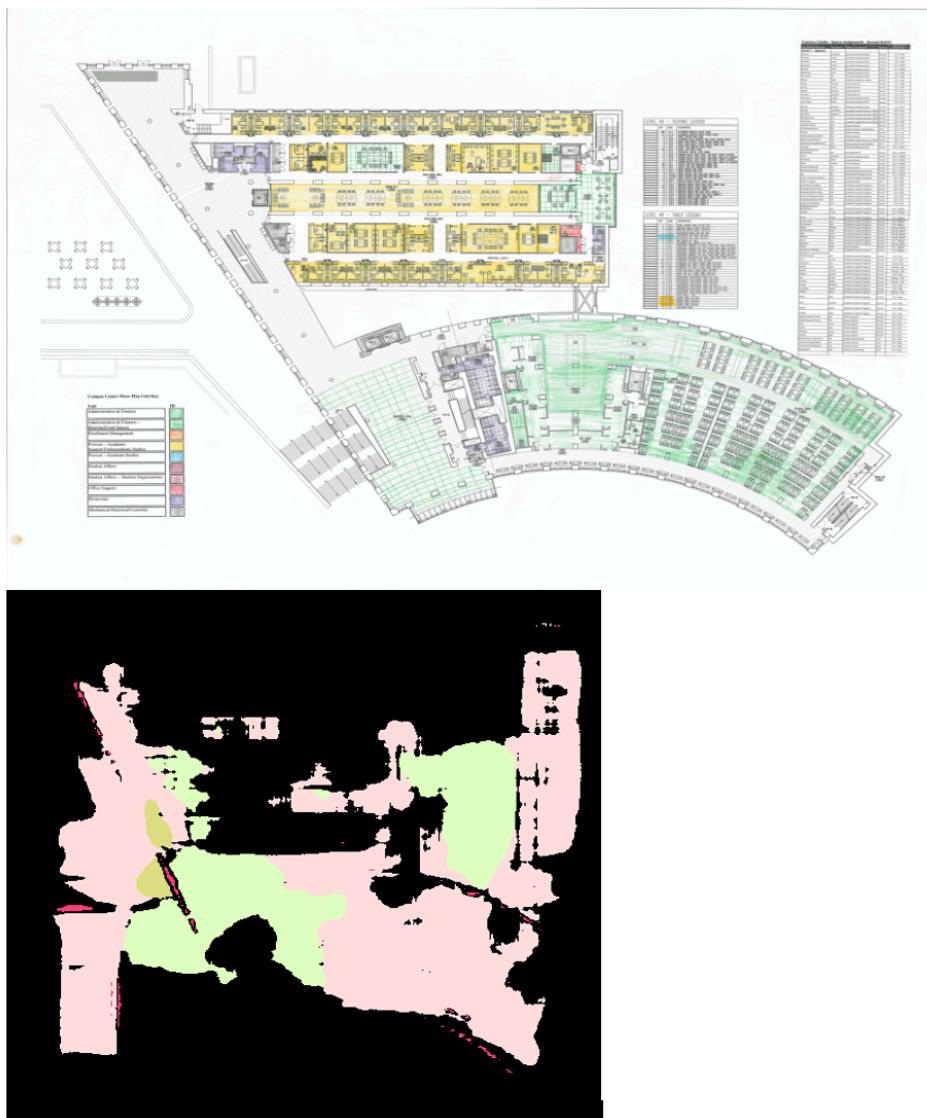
Applying the ICCV paper model to a complete campus floor plan layout
